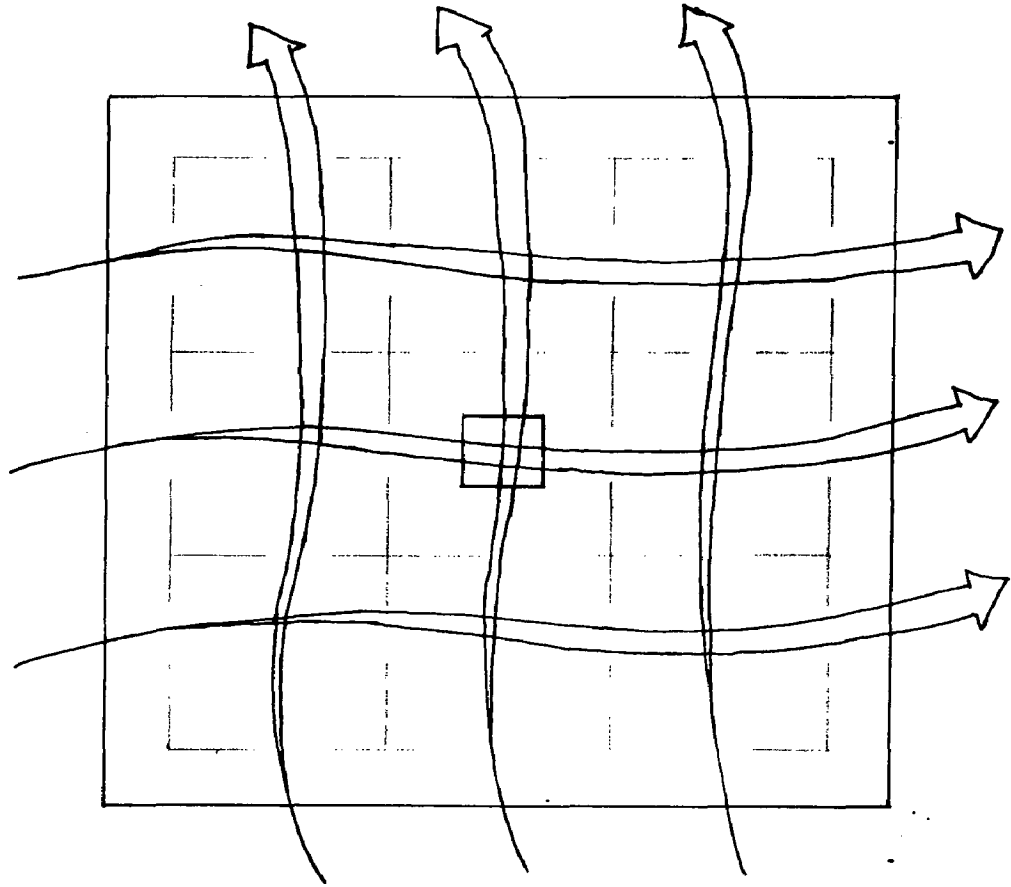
Cross Ventilation in Traditional '*Nalukettu*' plan
